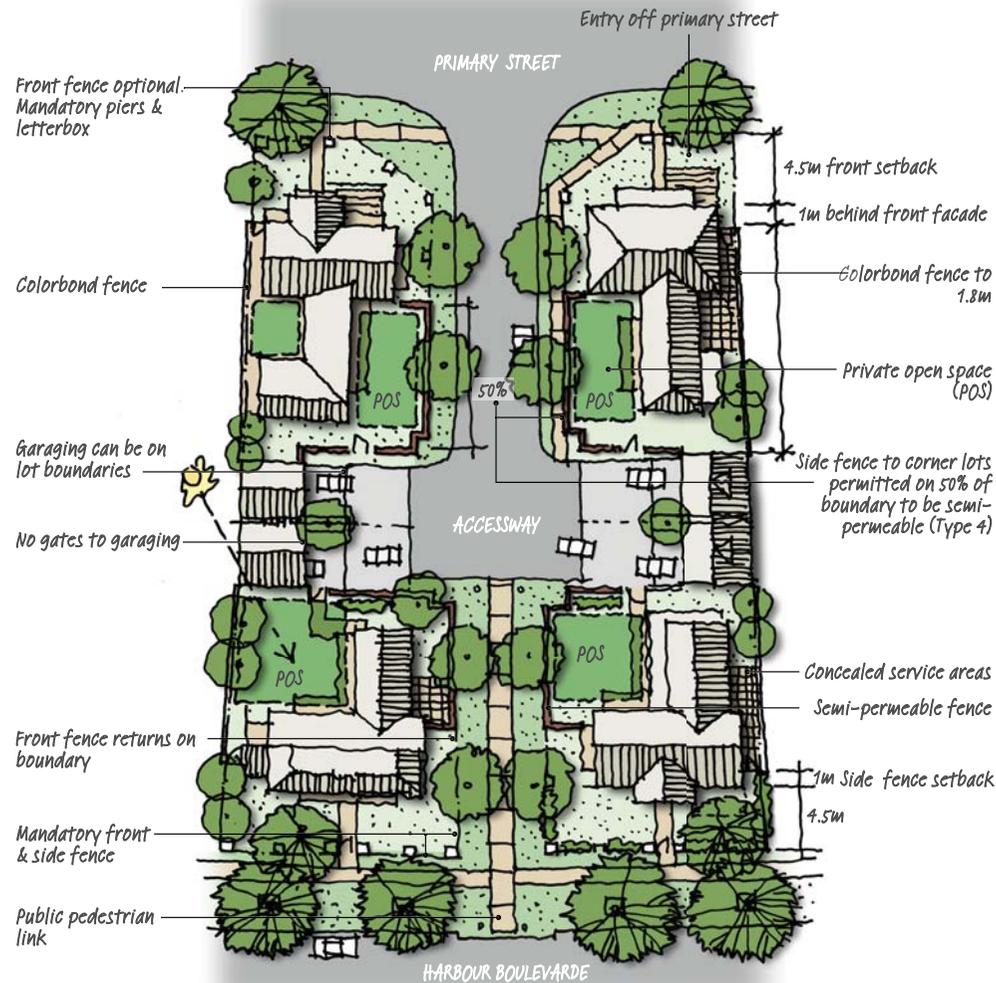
Corner lot fencing - special conditions to accessway link - Fence type 4
